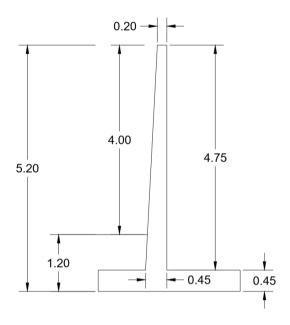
Cantilever retaining wall (Thickness of base slab)
